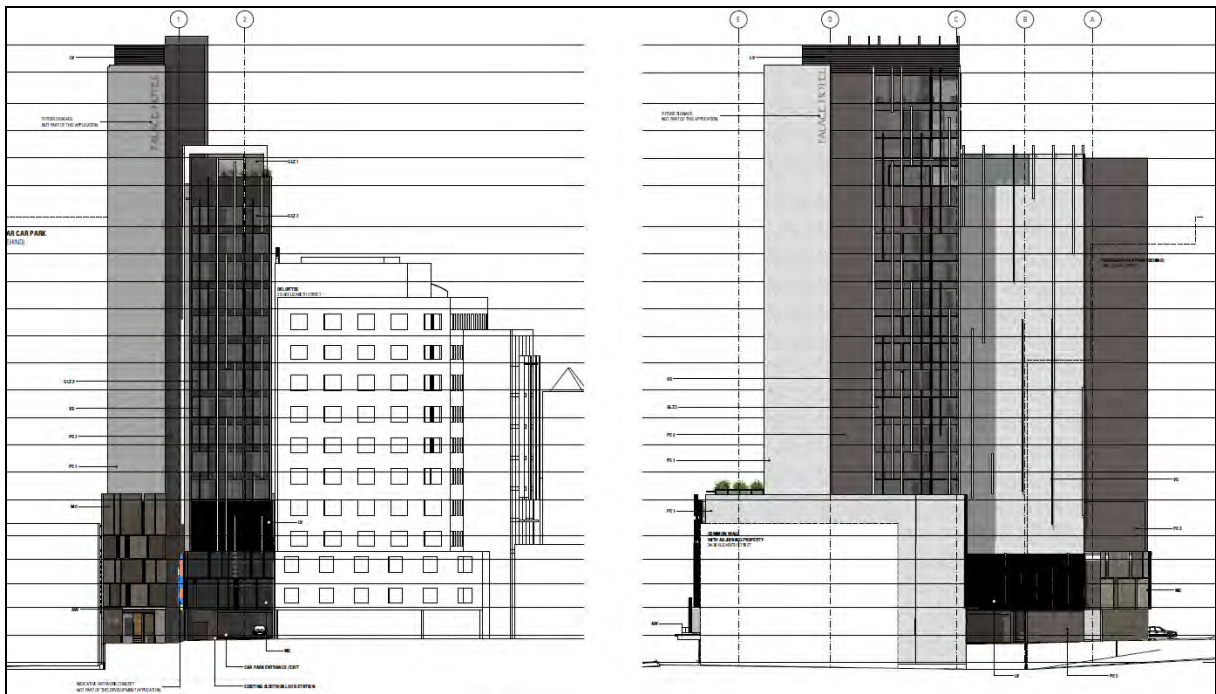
The south-western (rear) and north-western elevations of the proposed development.
